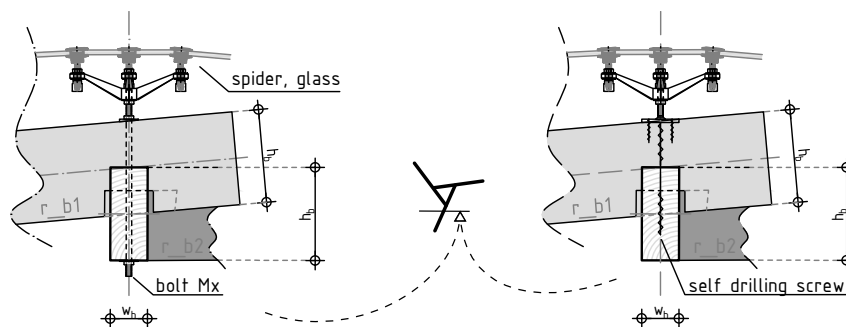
Roofing concept using a spider to elevate the glass from. The Glass can have a similar geometry as the load panels
